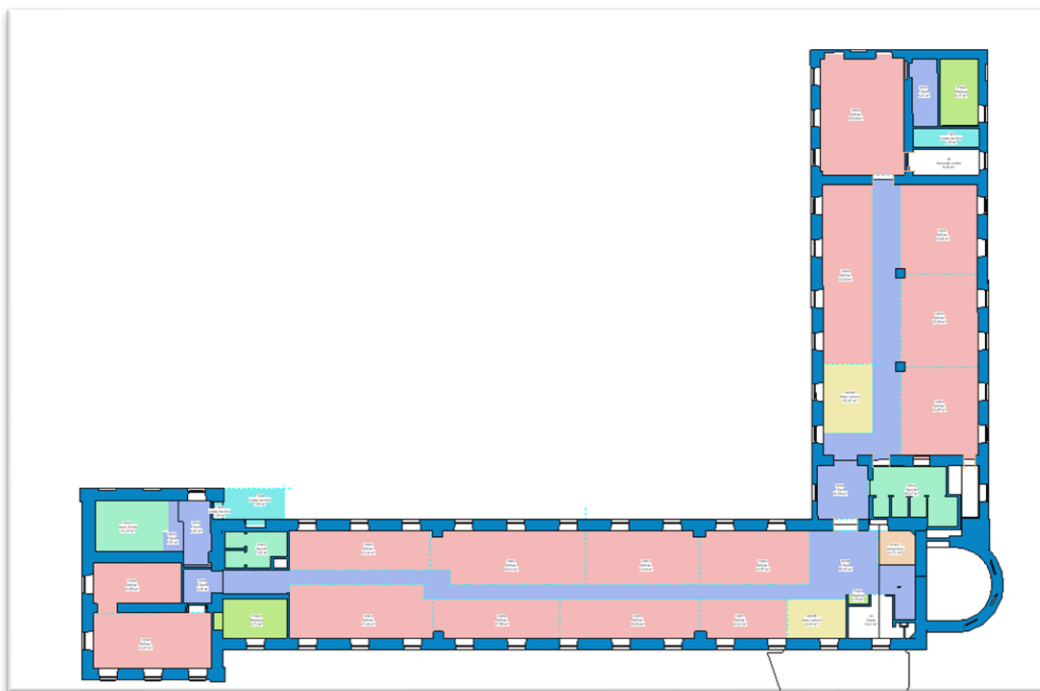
Thematic plan - First floor, Ex Buon Pastore building
